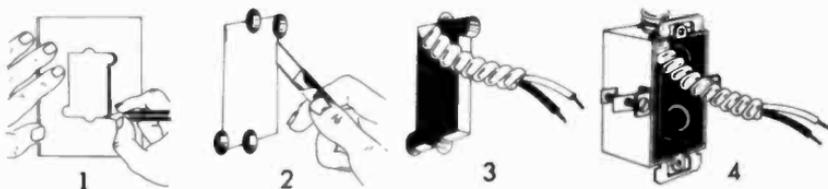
Installation of a box in plasterboard is similar to that shown in Fig. 4-12, except the type of box used holds onto the plaster or similar flat material. (1) Outline the cutout on the wall with the template of Fig. 4-11, after finding the center between joists. (2) Cut out the plasterboard with a hacksaw. (3) Draw the cable through and fasten into the box, using a type such as Figs. 2-4A and 2-5 of Chapter 2. (4) Place the box in position and draw up on the two screws on the sides. The side ears will draw up behind the wall, and the two ears at top and bottom will hold from the front. Before installing the box, adjust the top and bottom ears so that the front edge of the box is flush with the front of the wall.
